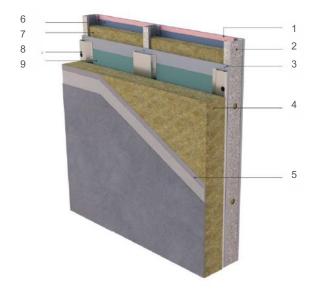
External Wall with PIR Insulation & Rendored Masonry Outer Leaf - Warm Frame
